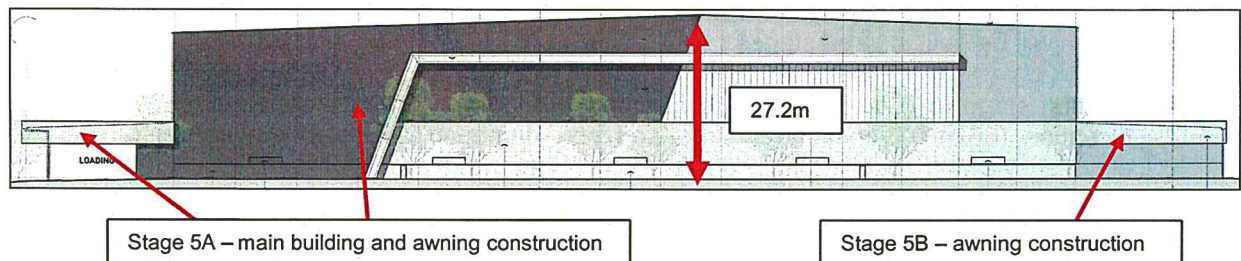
Proposed southern elevation (showing eastern and western awnings)
